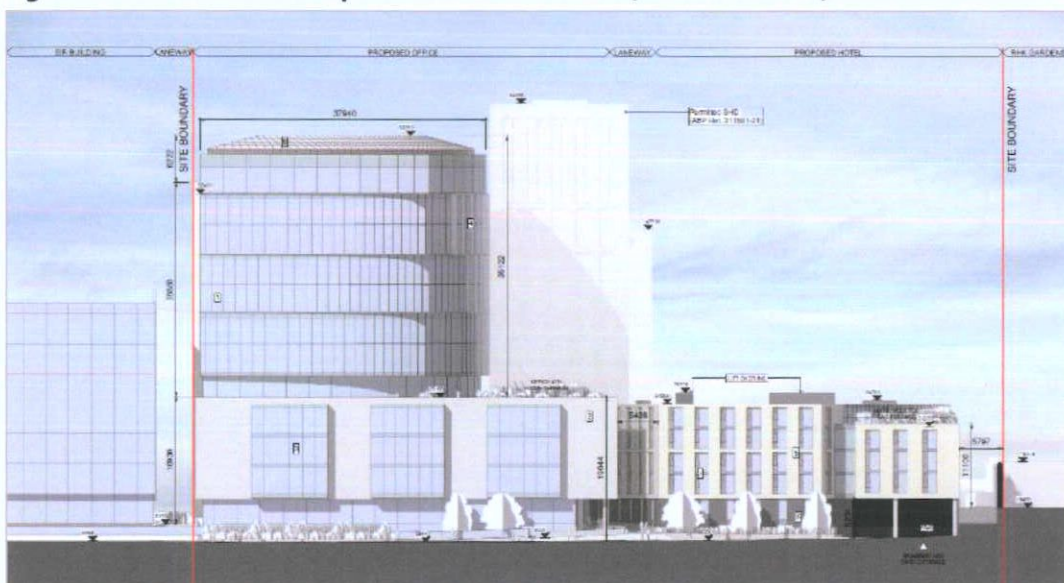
Proposed South Elevation (to Plaza).
